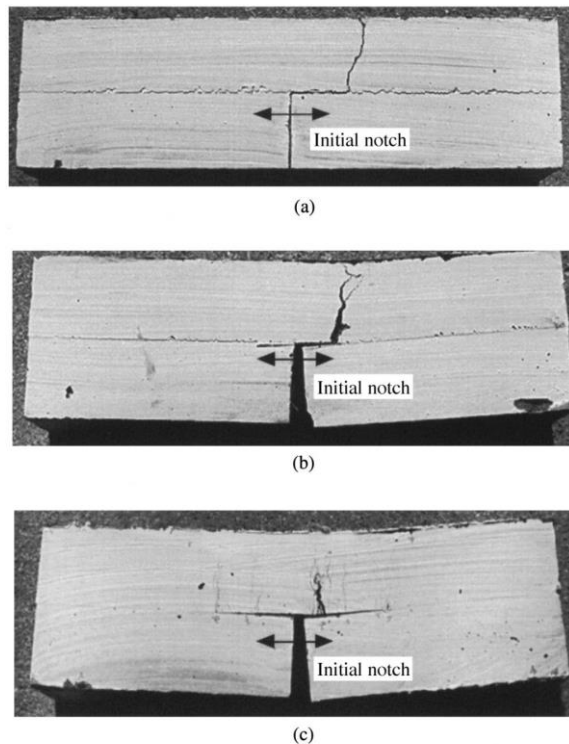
Failure mode of a) concrete/concrete, b) FRC/concrete and c) ECC/concrete beams (Li et al., 2000)
